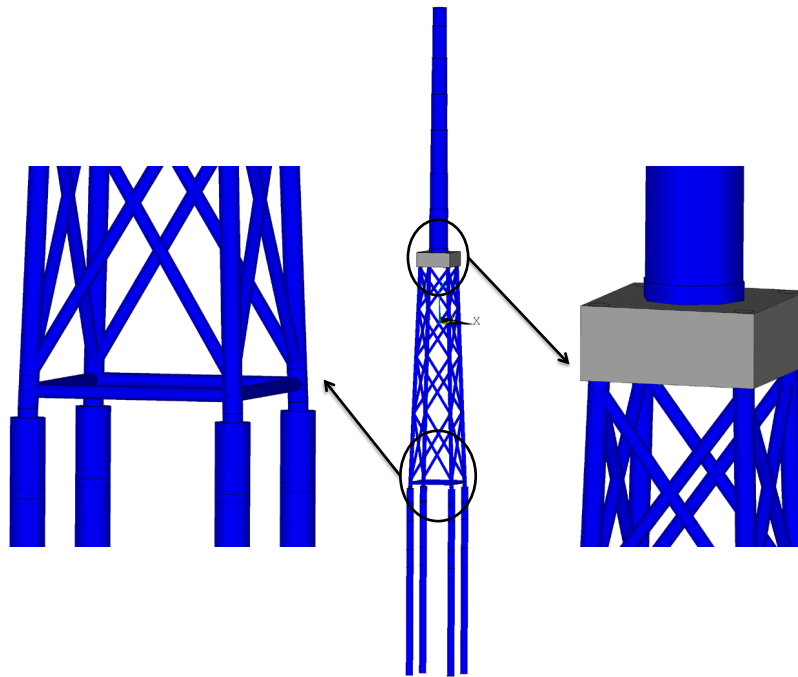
Jacket with tower and piles (middle), concrete TP (right) and pile heads in detail (left).
